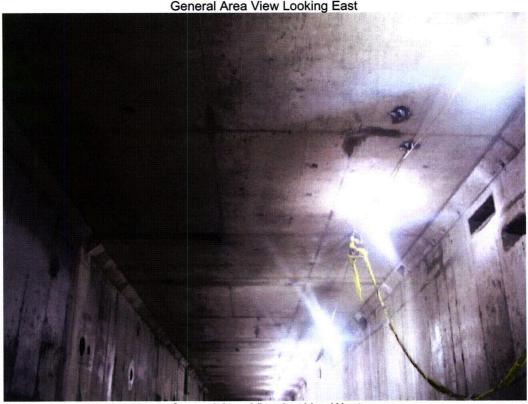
, Views of SEB Cold Pipe Tunnel Ceiling(Survey Unit SE-3-23)
